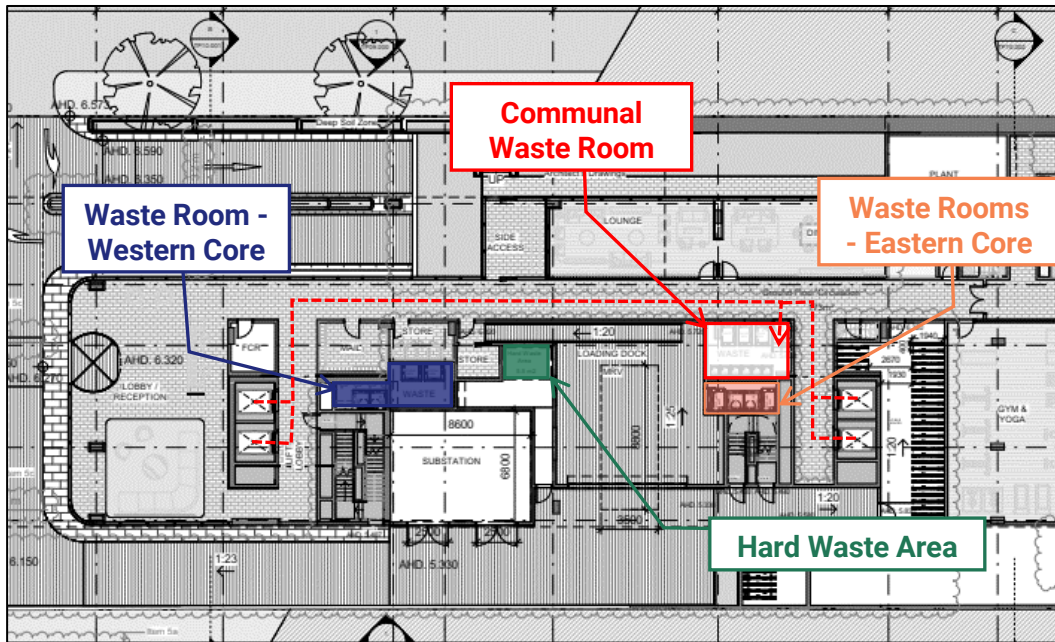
Proposed Waste Areas & Pedestrian Access Route
